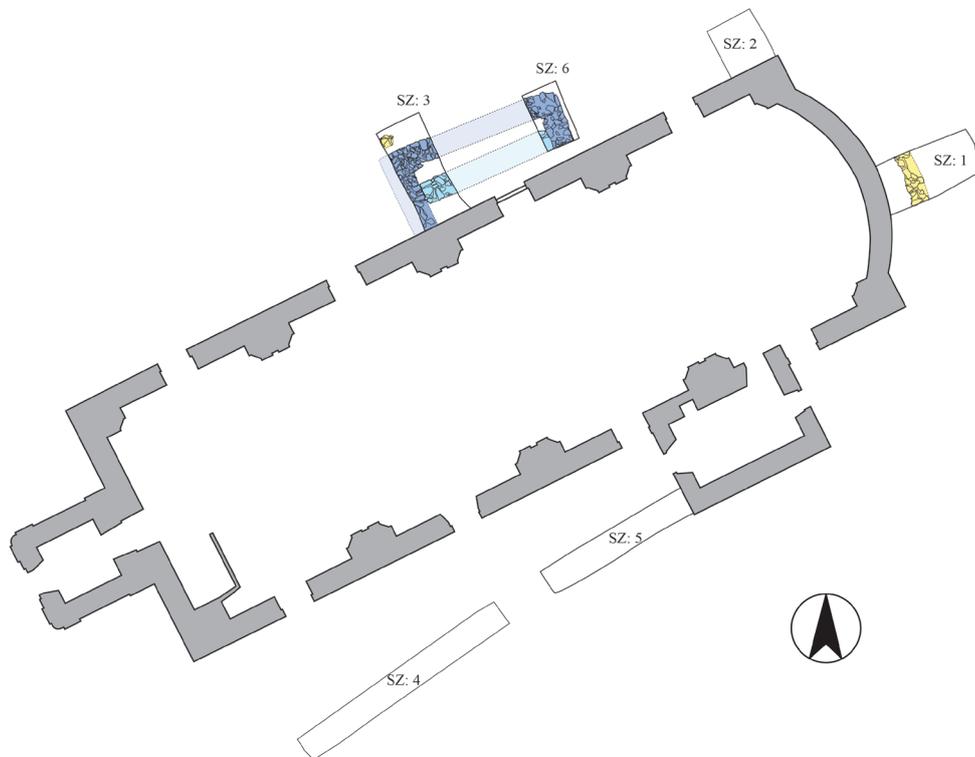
The ground plan of the church with the newly discovered building (graphic: R. Rakonczay).
